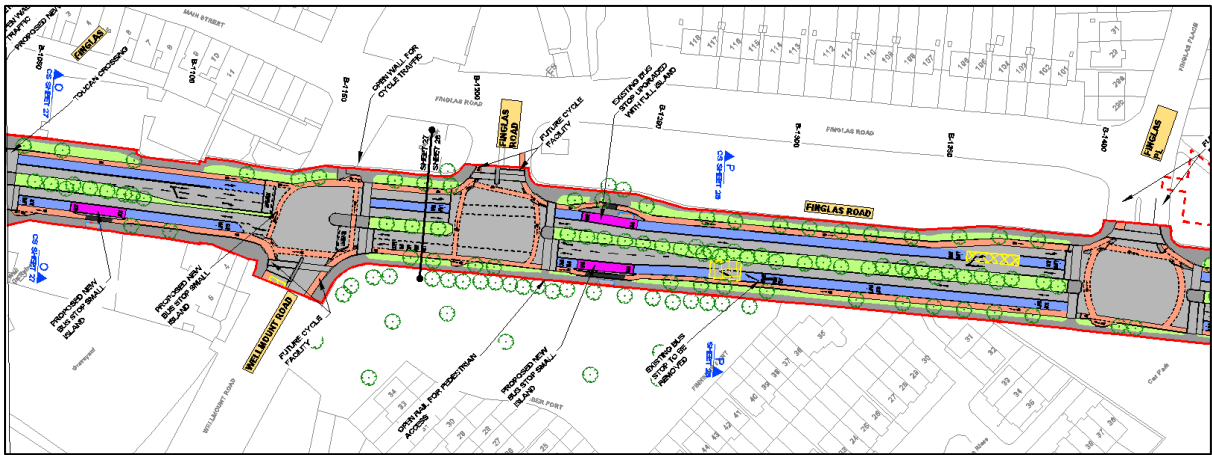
Extract from General Arrangement Drawing Sheet 26
